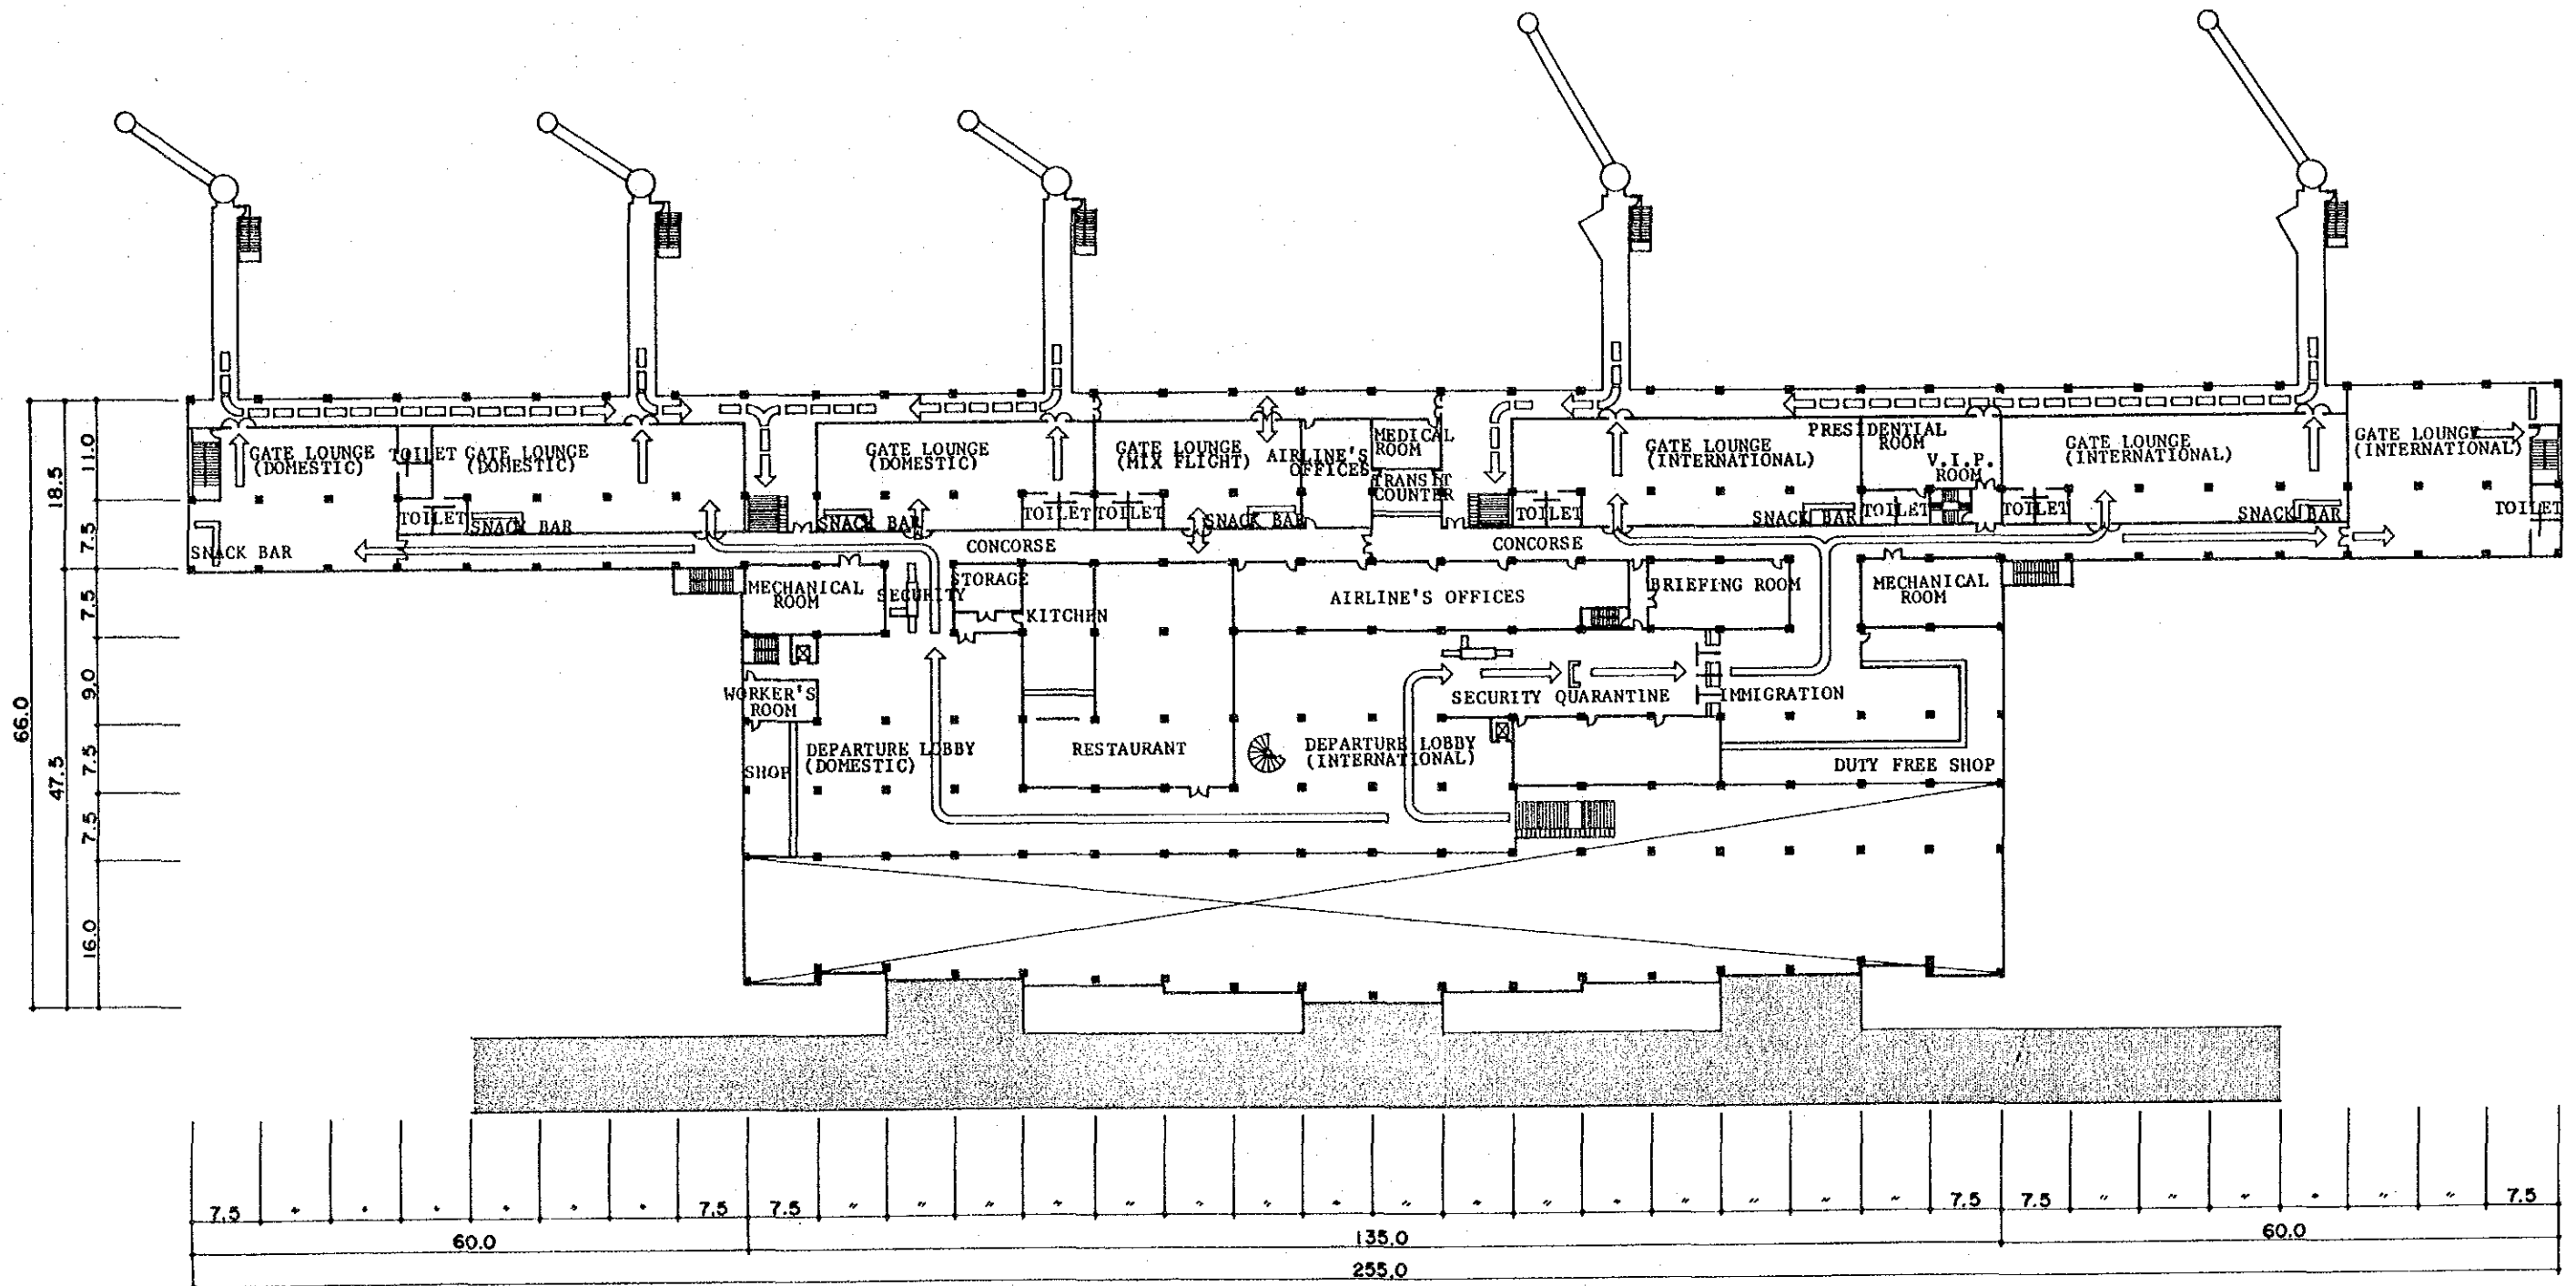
Passenger Terminal Building First Floor Plan
